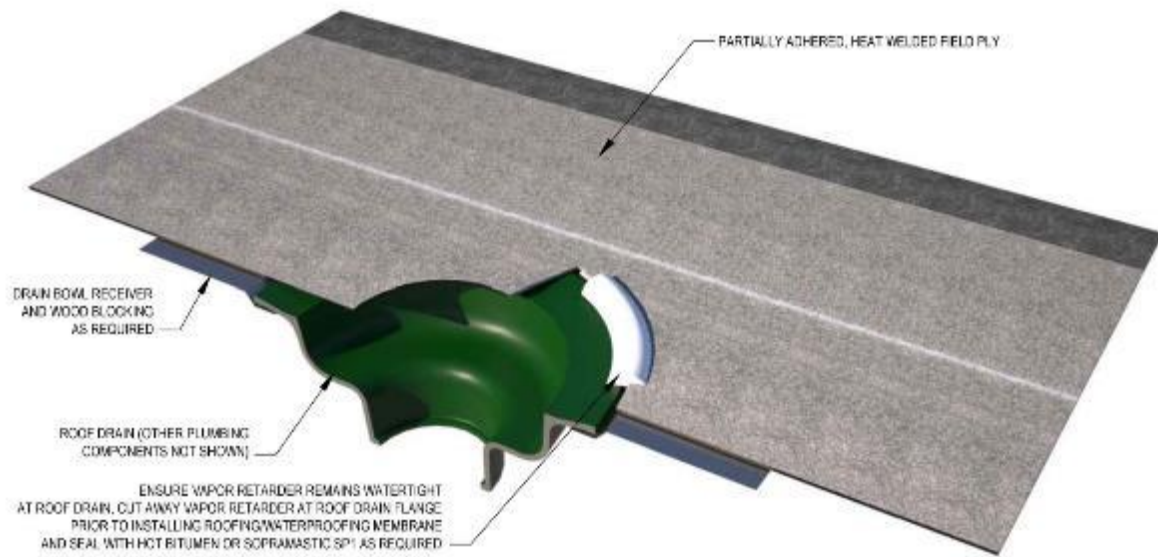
Partially Adhered, Heat Welded Vapor Retarder at Roof Drain
